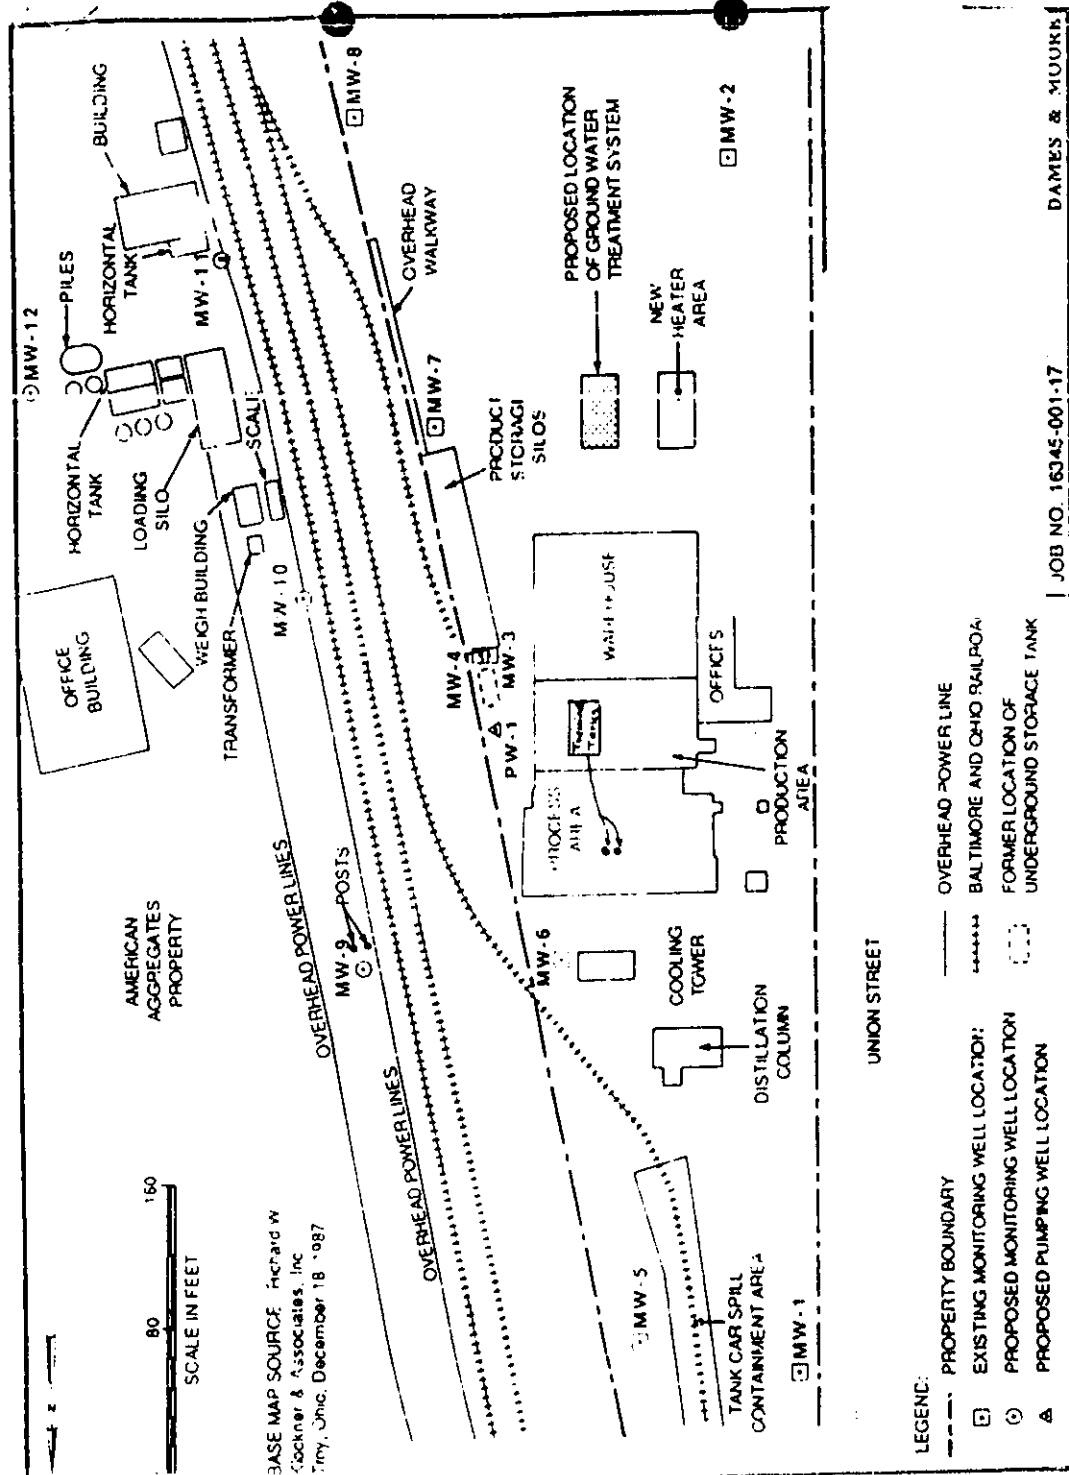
PLANT PLOT PLAN WITH MONITORING WELL LOCATIONS
